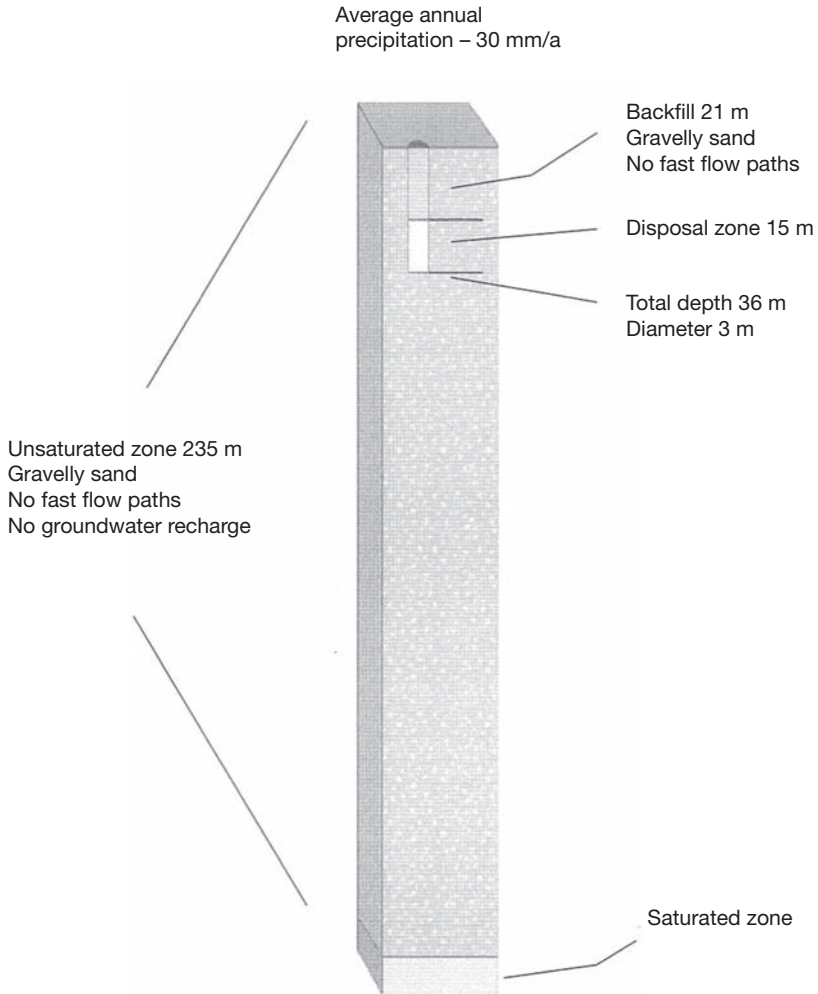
Cross-section of the Greater Confinement Disposal Facility at the Nevada Test Site, USA [A-2].
